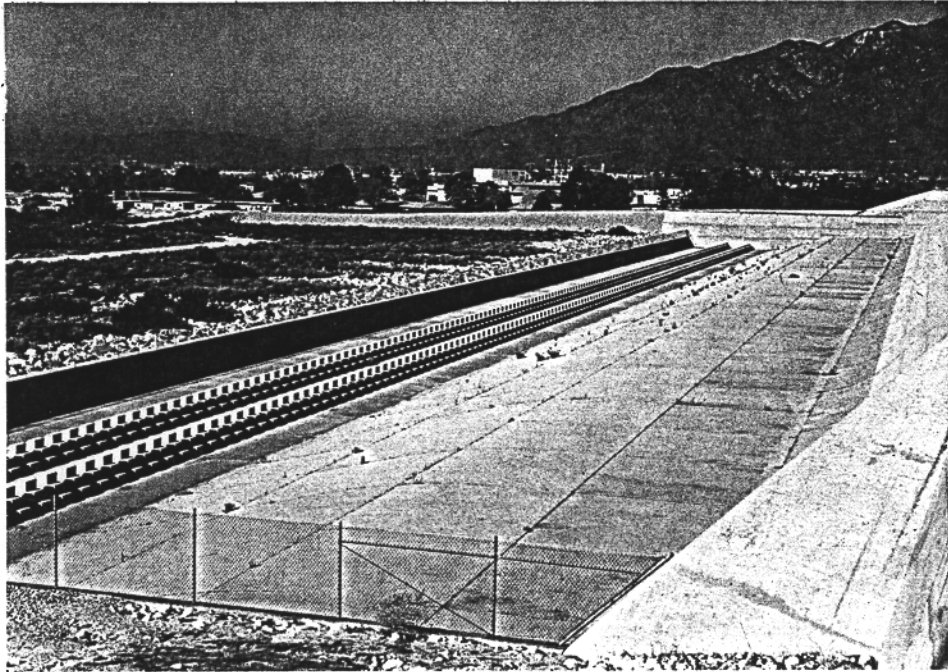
Photographs of the Santa Fe Dam outlet works.
